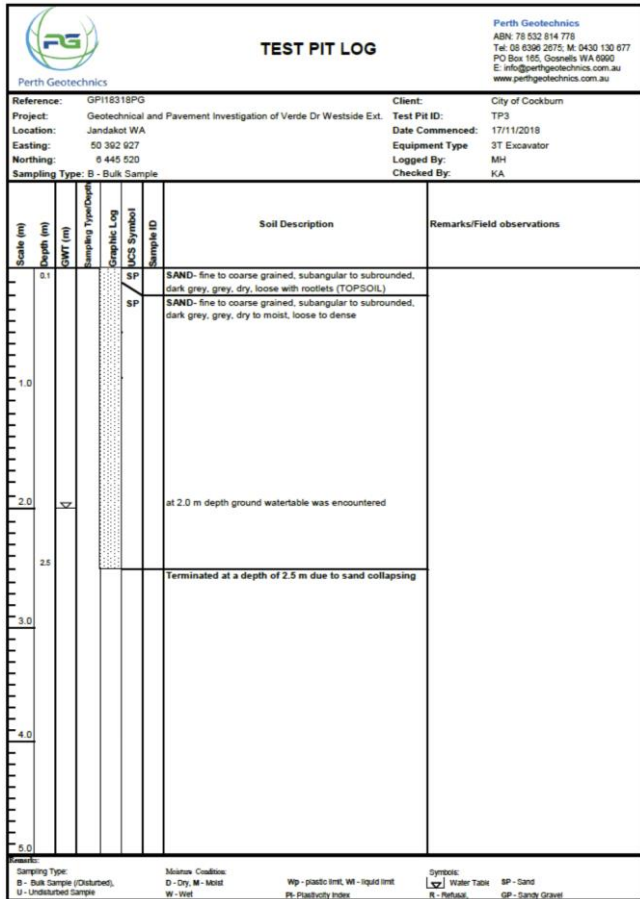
Test Pit Log (Verde Dr.) at Location TP3
